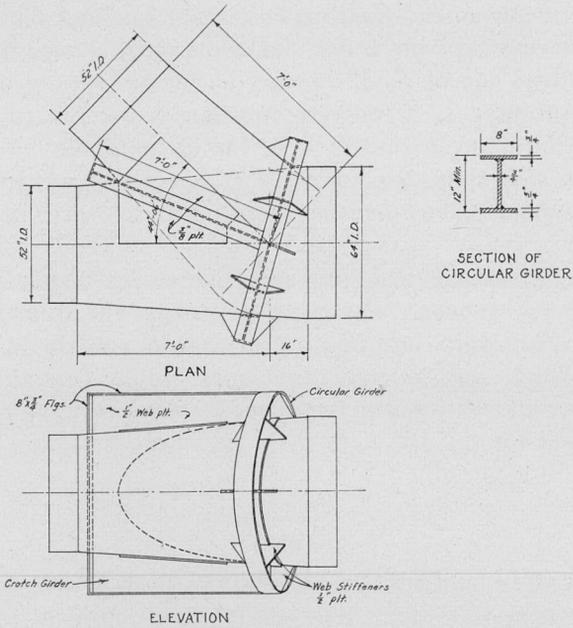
TYPICAL LATERAL, OUTSIDE CROTCH GIRDER TYPE REINFORCEMENT.
